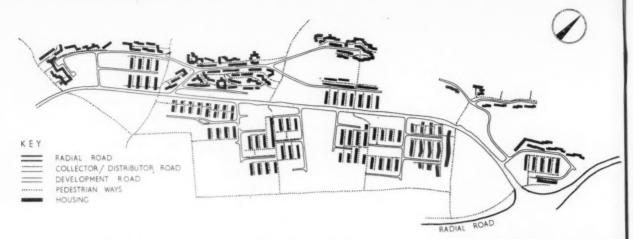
Housing layout on northern slopes, showing separate road and footpath systems. Scale 1/10,000.
